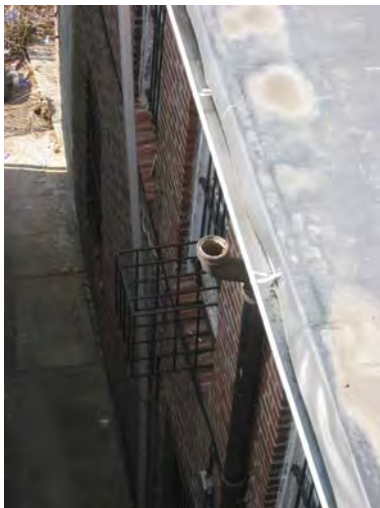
Aluminum gutter at lower roof. (Photo: BBB, 2007)
